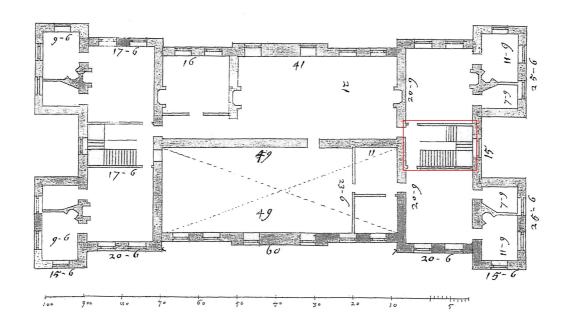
Late 17th-century first floor plan of Stowe House; east corridor marked with a red rectangle (provided by James Mackintosh of Purcell).
